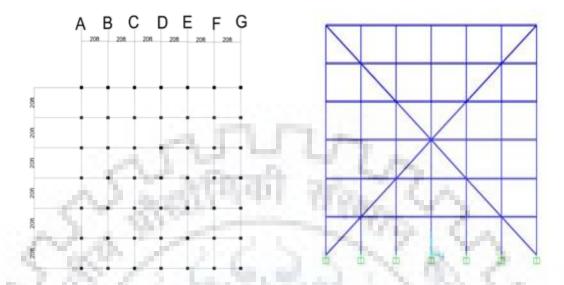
Plan of low-rise multistorey X-Figure 3.2 Elevation of low-rise multistoreybraced frameX-braced frame
